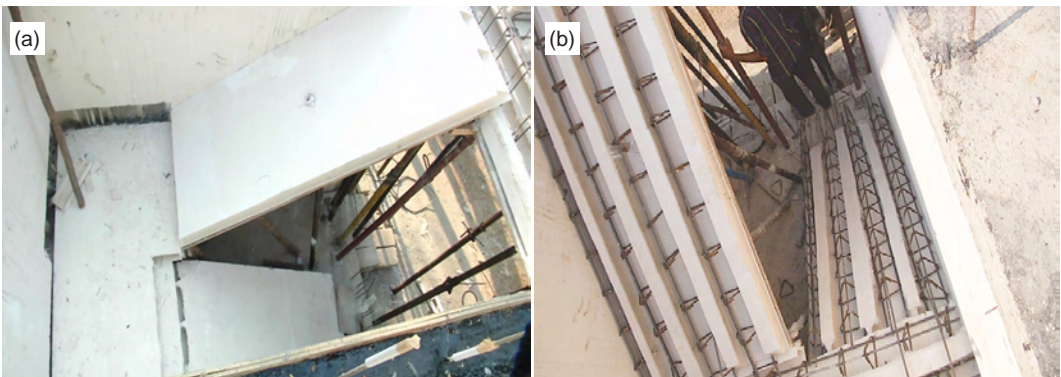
(a) GFRG panel used as waist slab for staircase, and (b) reinforcement for concealed beams in waist slab
